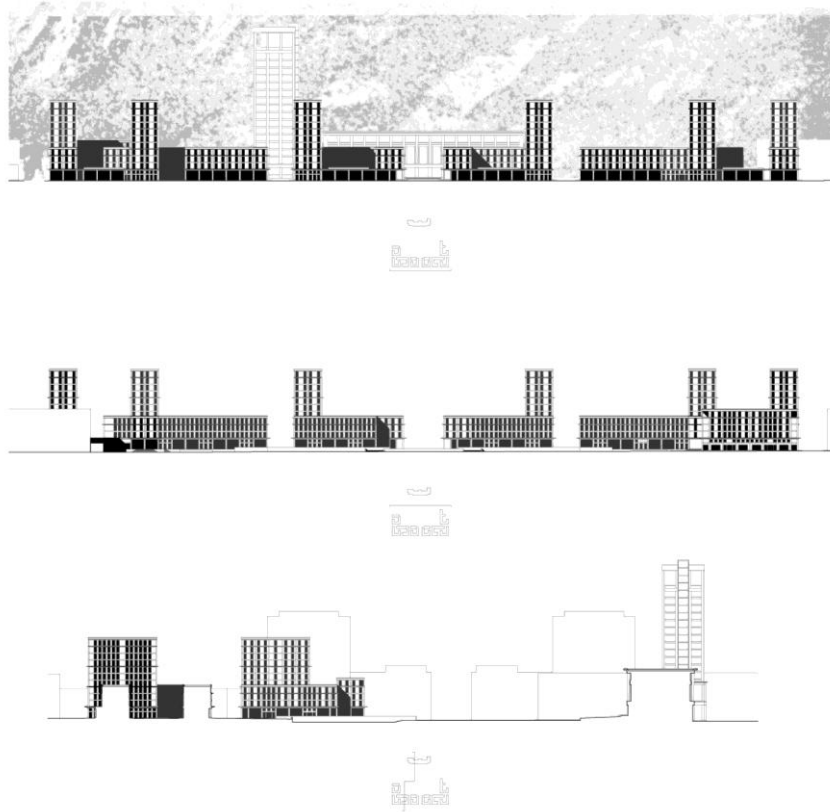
Place de l'Hôtel de Ville. Elevations and sections. Drawing of the author.
